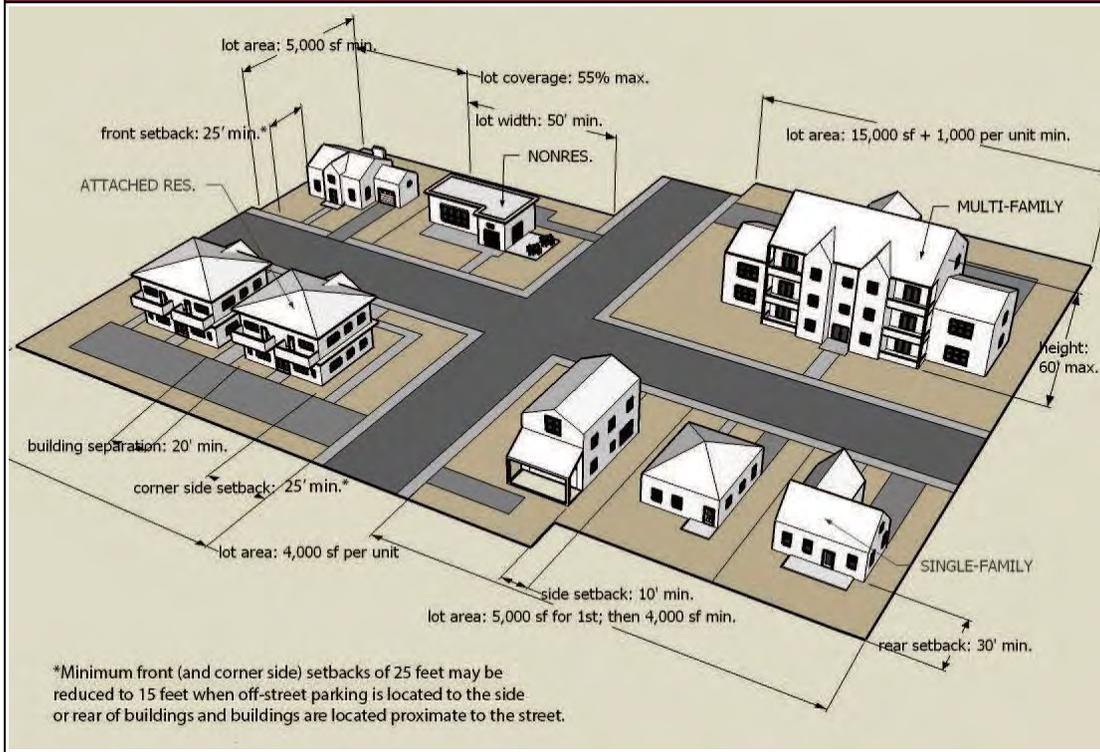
D.5.a: MR-5 Typical Lot Pattern	Figure 30-3.D.5.b: MR-5 Typical Building Form
